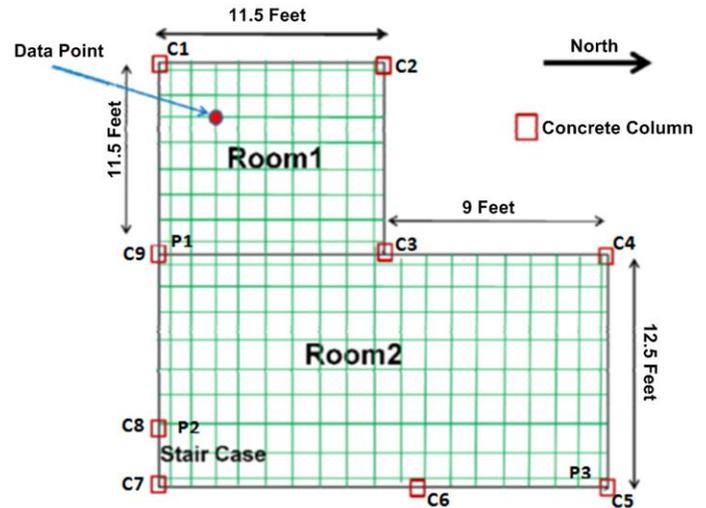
Floor Plane of data collecting area (two rooms in a house)
